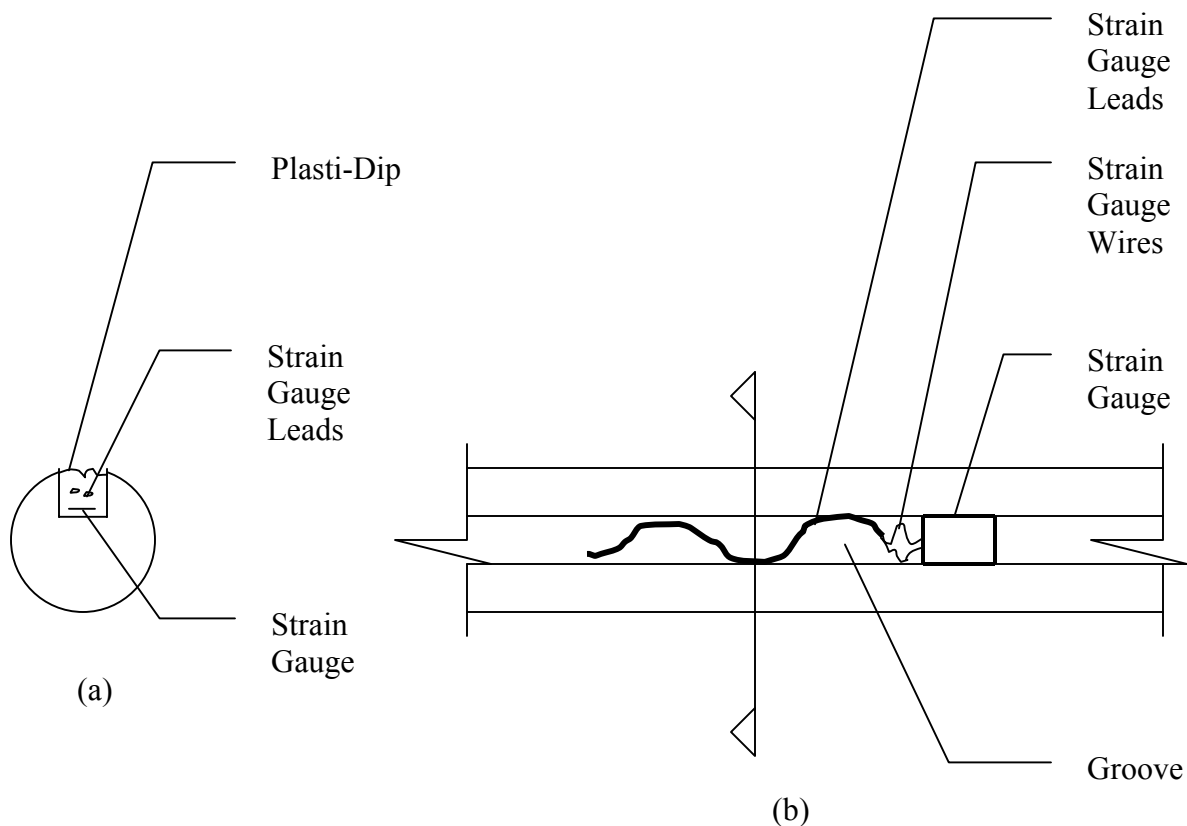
a) Cross-sectional view of gauged bar. b) Plan view of a section of gauged bar.
